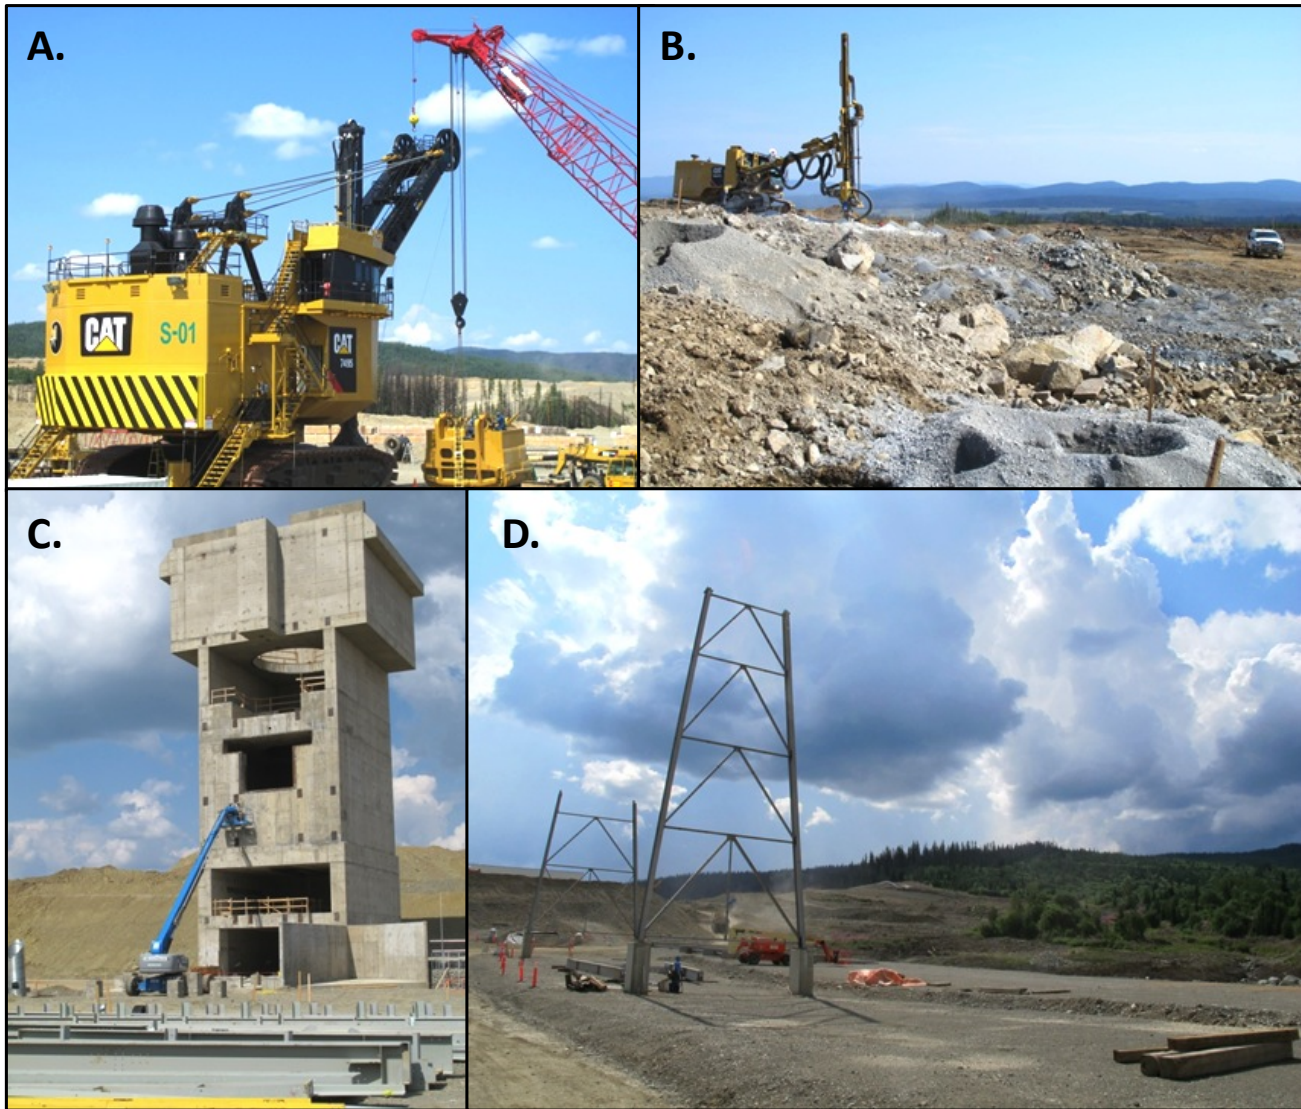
Mt. Milligan Mine Construction project – A. Assembling electric shovel in laydown yard; B. Blast-hole drilling on MBX stock; C. Crusher tower construction; D. Struts for conveyor to mill.
